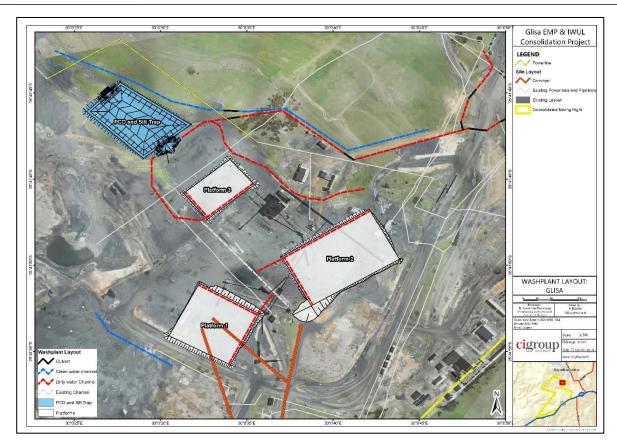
Proposed Site Layout around the Glisa Section CSWP.
